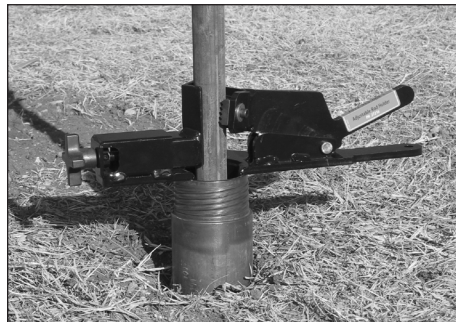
Adjustable rod holder installed on a 3.25-inch outer casing.
